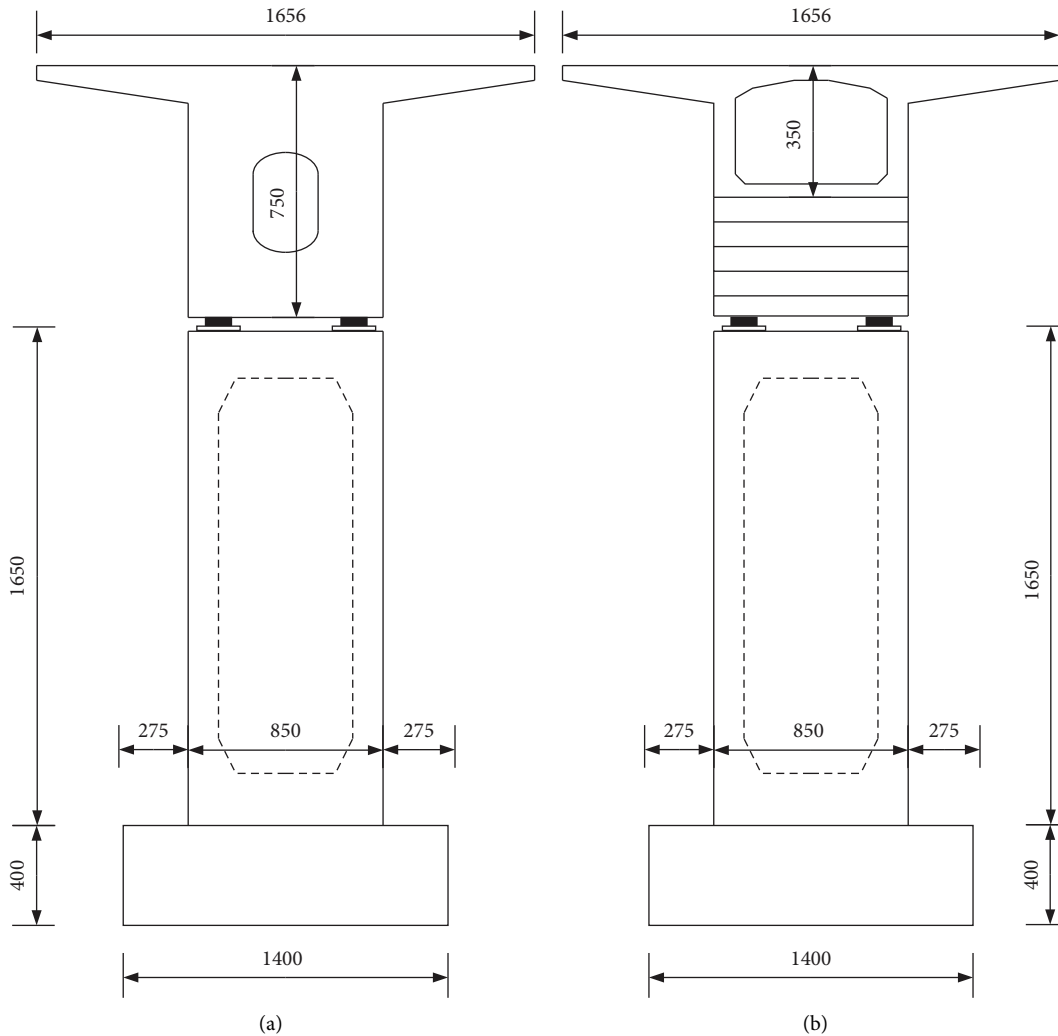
Transverse views of the bridge (unit: cm): (a) cross-section of the top of the pier and (b) cross-section at the midpoint of the span.
